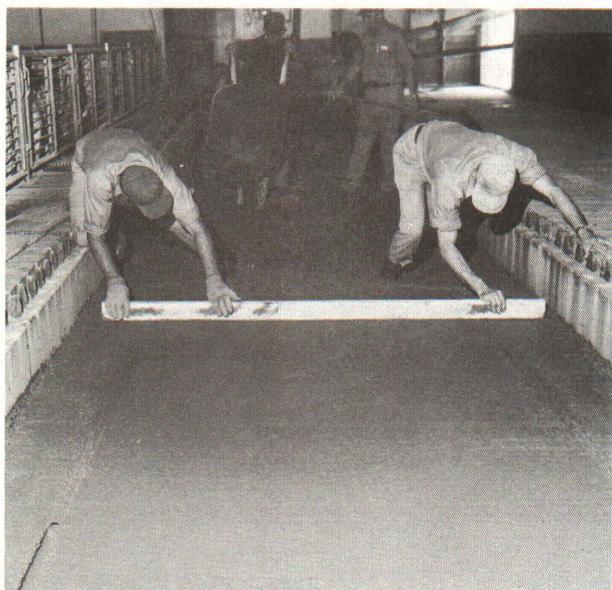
Skirting concrete on two 1" pipes resting on the 2" x 4" stakes. Since the pipes have an outside diameter of $1\frac{1}{4}$ ", the length of the stakes must be reduced by this amount to give the desired floor elevation.
